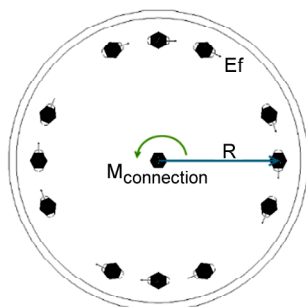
The connection plates and bolts- friction force due to their pretension load.
